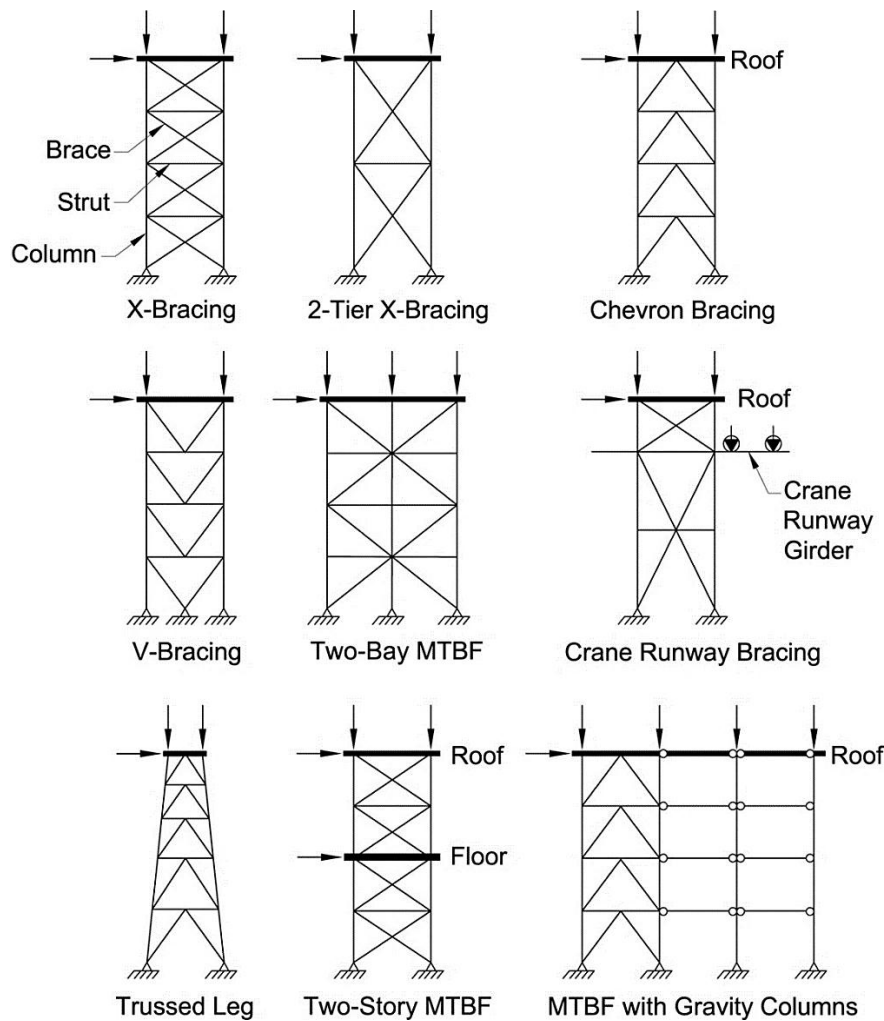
Multi-tiered Braced Frames (AISC 341, 2016)
